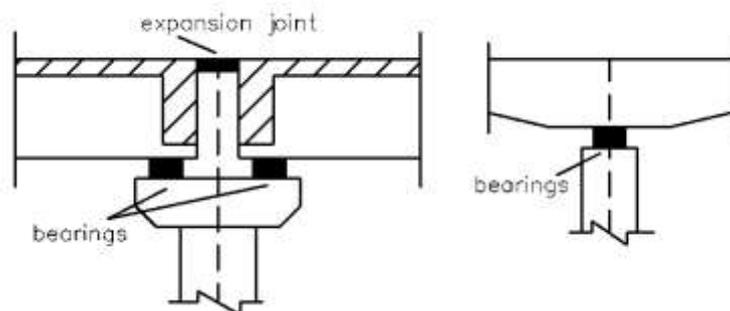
Detail at pier: Precast girder and Continuous post-tensioned girder.
